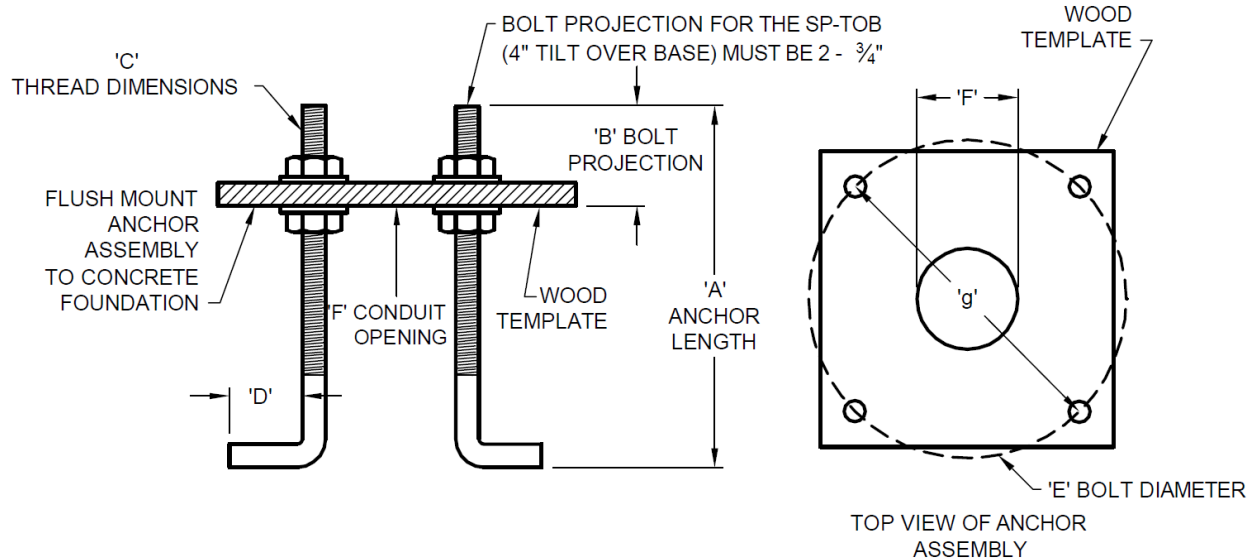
METHOD OF FIXING OF CAST-IN PLACE ANCHORS
